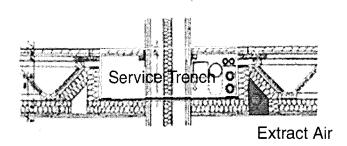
Section through the service trench/floor cassette. The small area used for the ventilation ducting can be seen adjacent the steel W sections.
